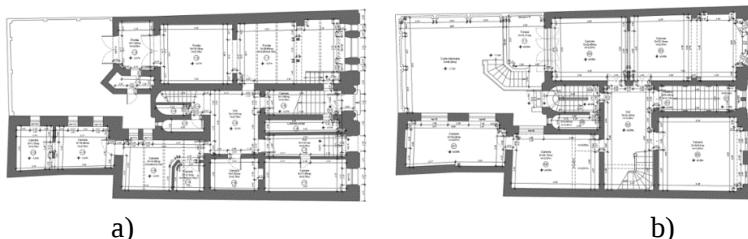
Structural survey: a) basement; b) ground floor [122]
